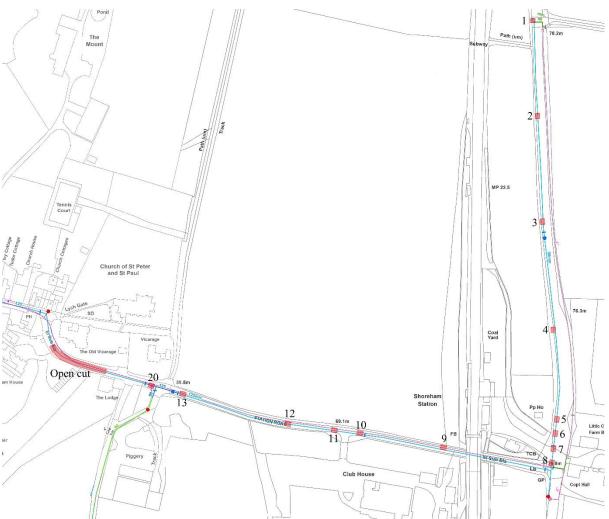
Showing the locations of pits 1-13 and a section of open cut trenching along Shoreham Road and Station Road.
